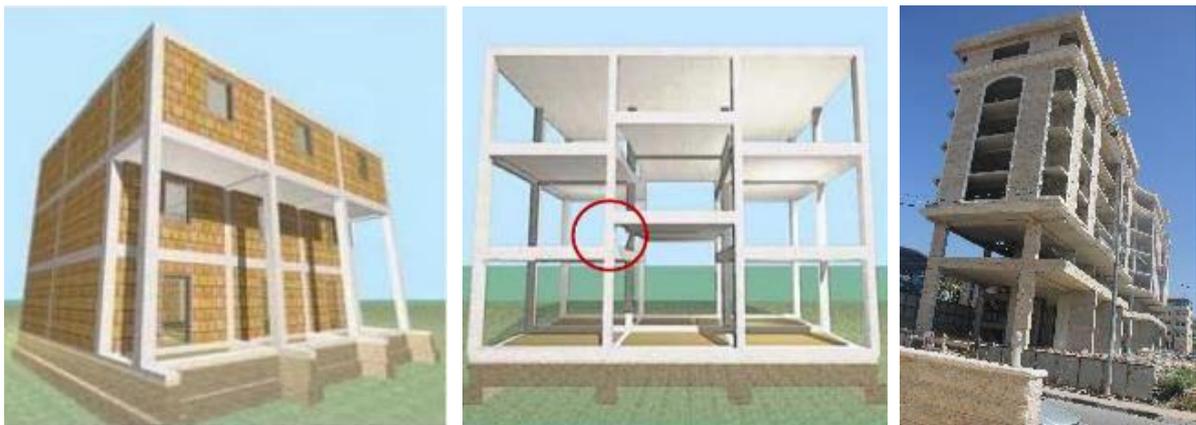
Tall column (left and centre) [6] and short column (right) examples.
